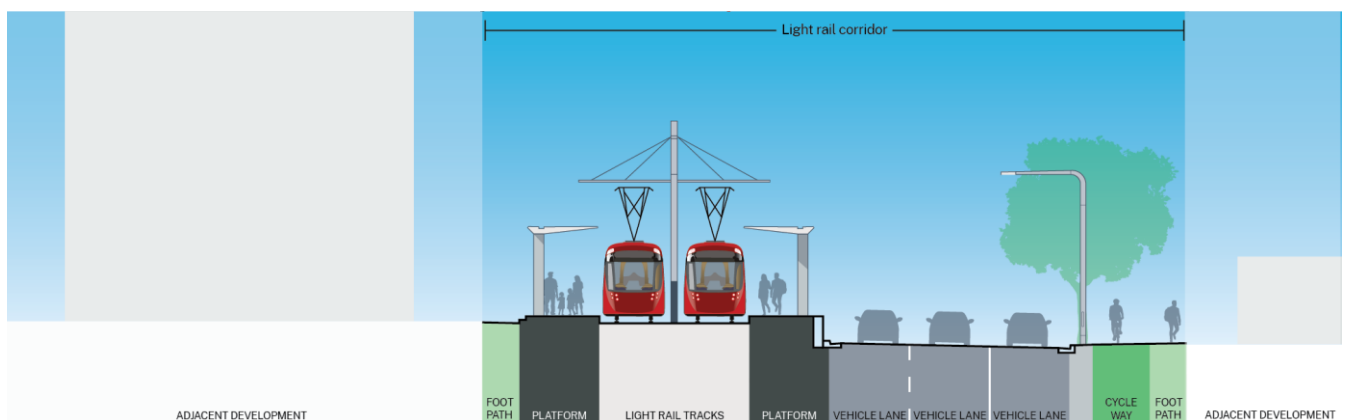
Indicative cross section of an on-road (segregated) arrangement with stop adjacent to general traffic lanes
